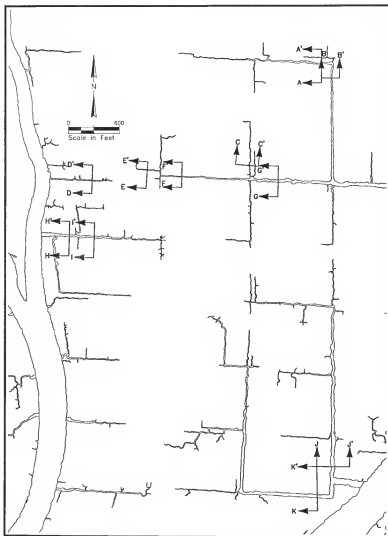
Section A-A' through K-K' surveyed cross-section locations.
